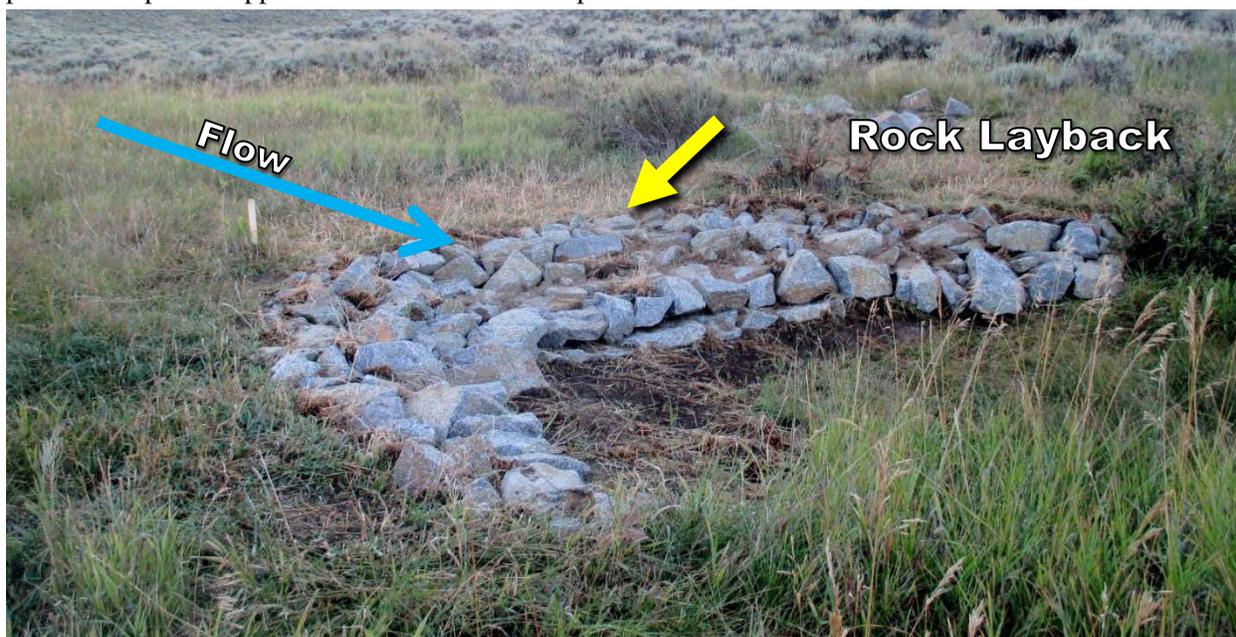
Rock laybacks can be used to treat long, shallow headcuts. Start with a row of large rocks as the footer, then build the stacked wall of rocks by leaning rocks into the slope for stability. Ensure the top rocks of the layback wall match the existing elevation of the headcut pour-over (denoted by yellow arrow). Photo by: Shawn Conner
